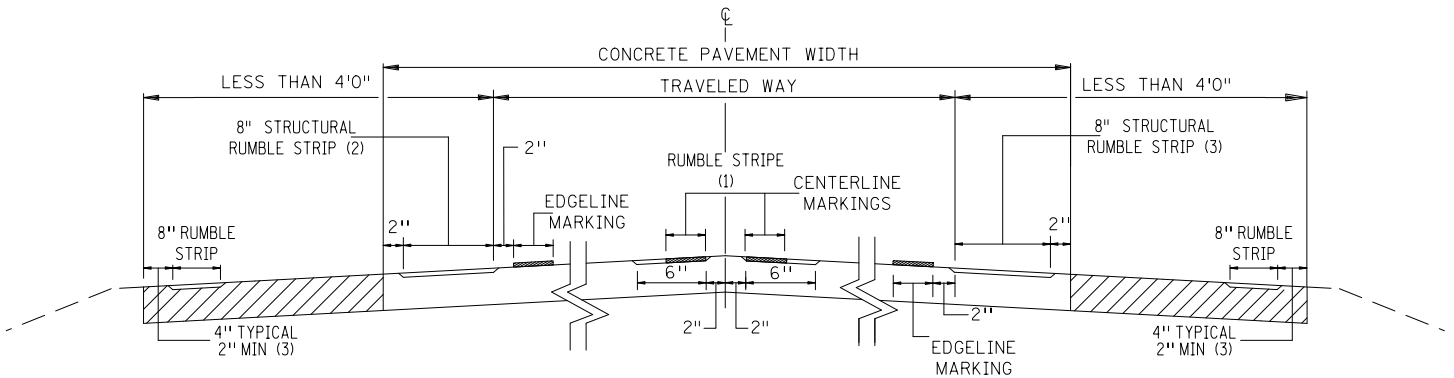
C - CONCRETE PAVEMENT WITH LESS THAN 4' PAVED SHOULDERS
